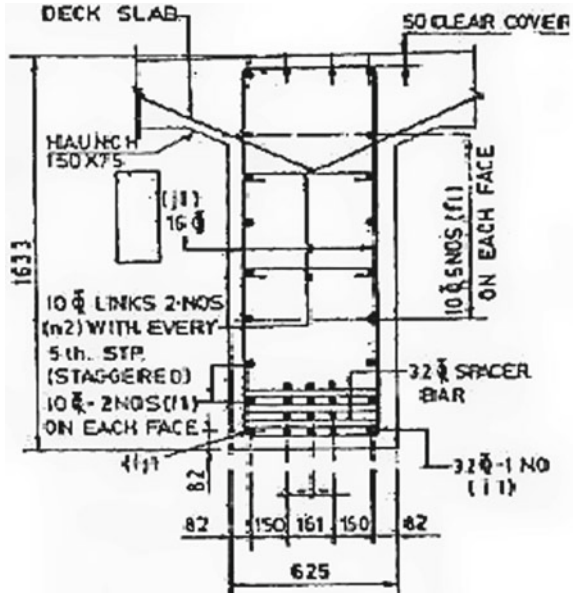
Cross-section of T-beam bridge girder for 18 m span
